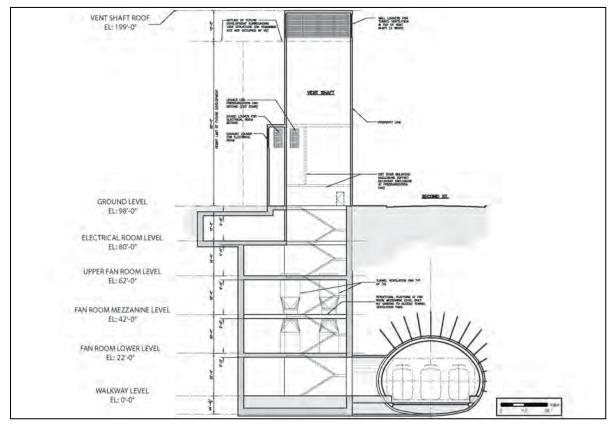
Vent Structure at 701 Third Street - Cross Section
